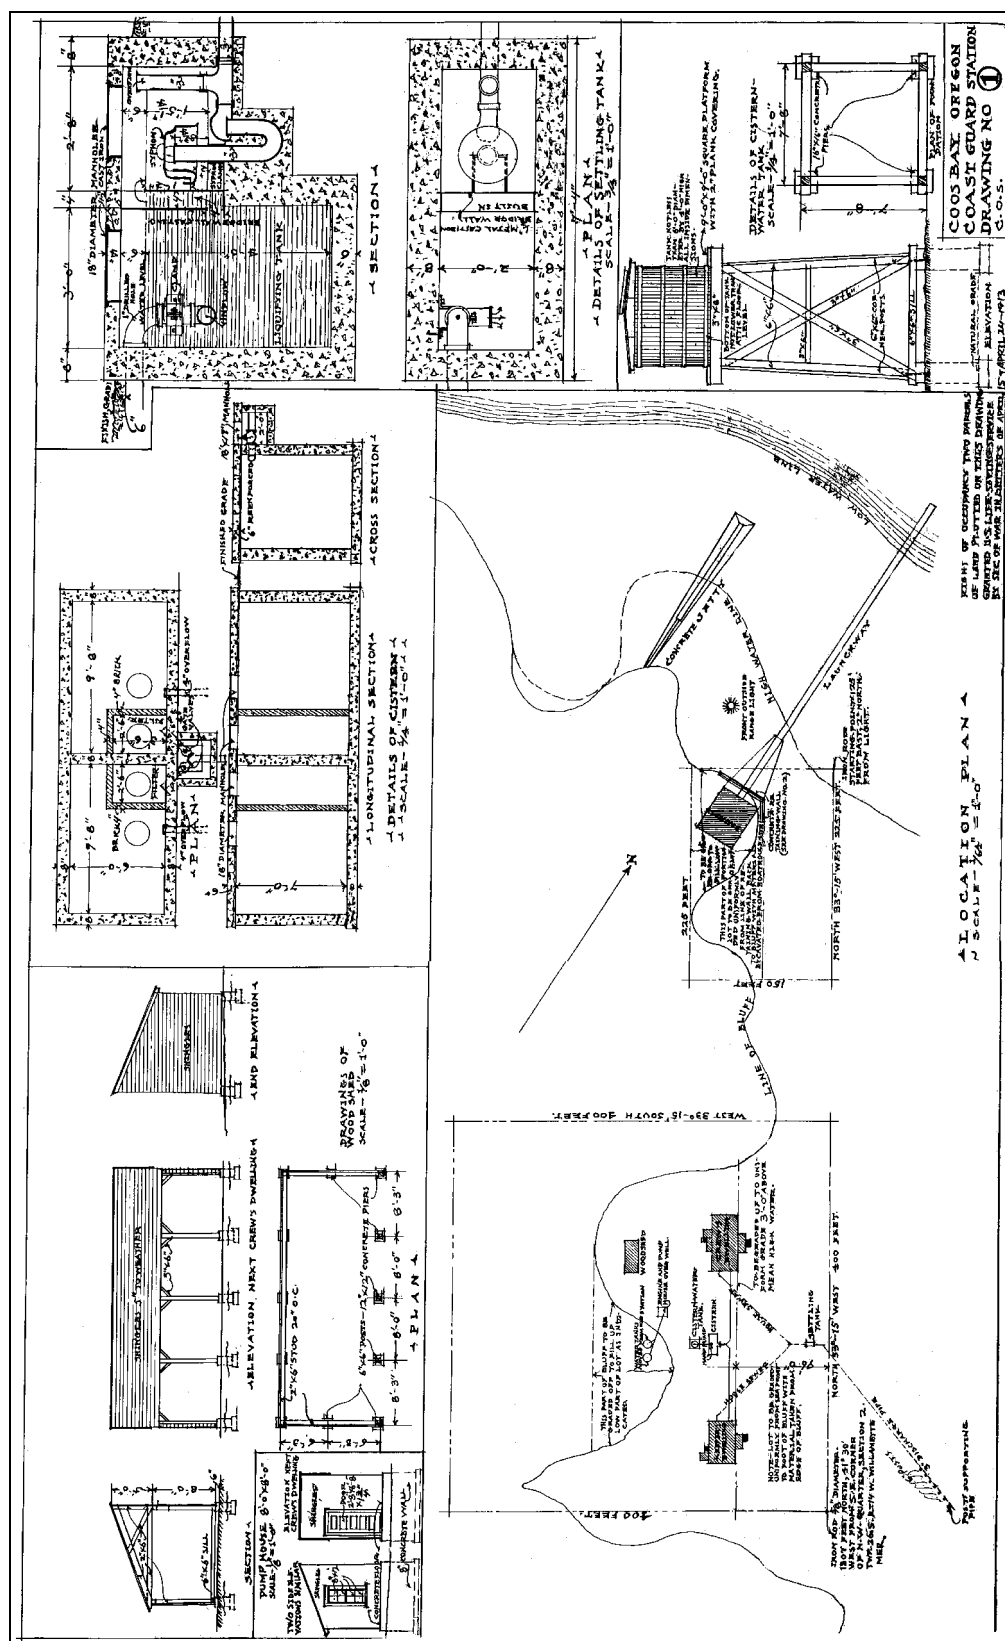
Coos Bay Lifeboat Station, Site Plan, 1915. Source: Oregon Institute of Marine Biology.
